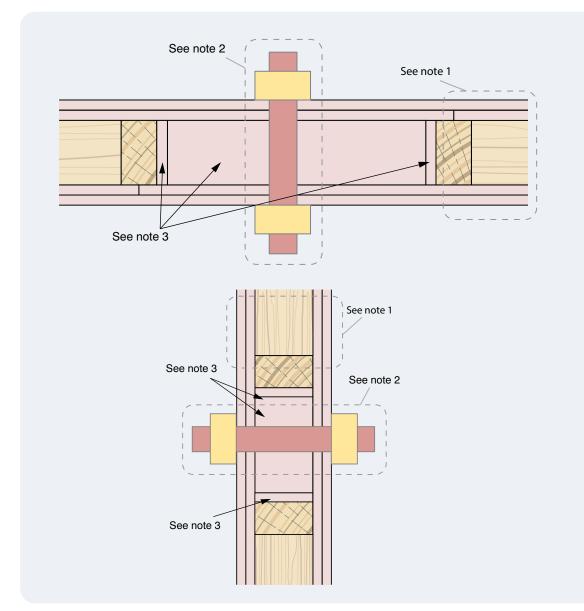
Plastic pipe penetration through fire-protected timber-framed walls with internal linings.
